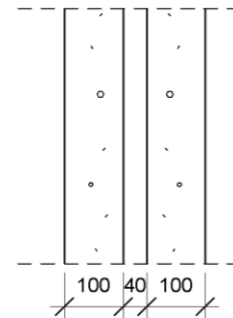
DESIGN 2 CAST IN SITU CONCRETE
